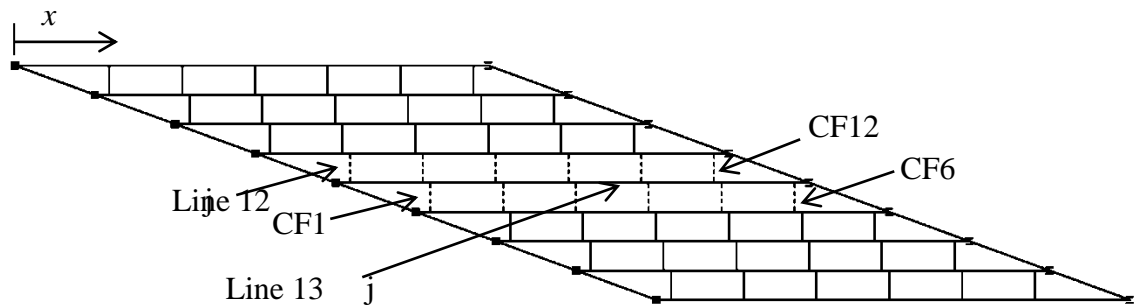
NISS14 Bridge with girder G5 connected only at the abutments
